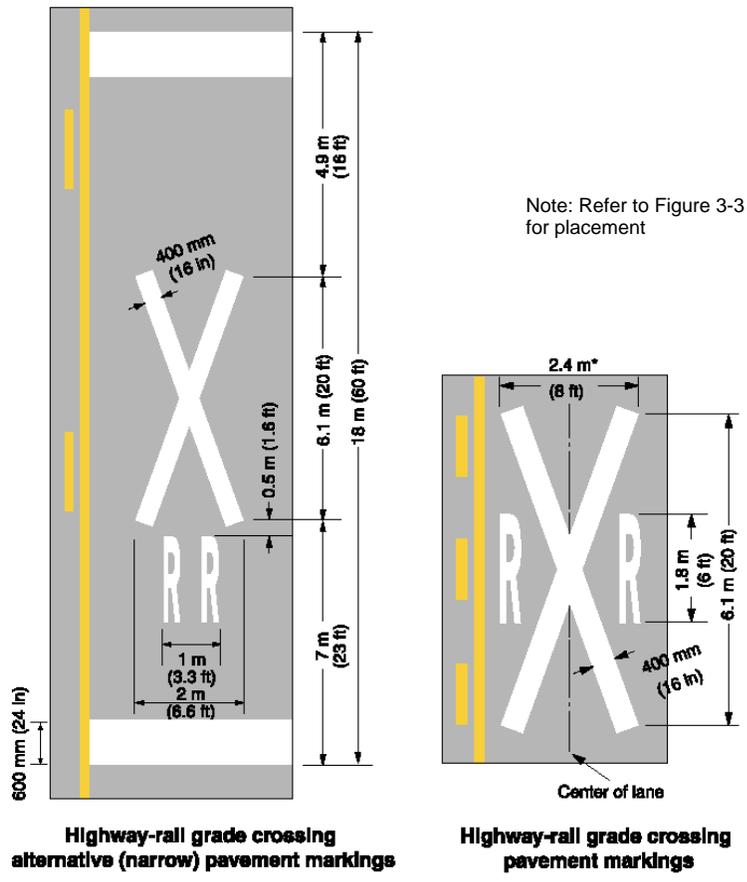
Example Highway-Rail Grade Crossing Pavement Markings.
